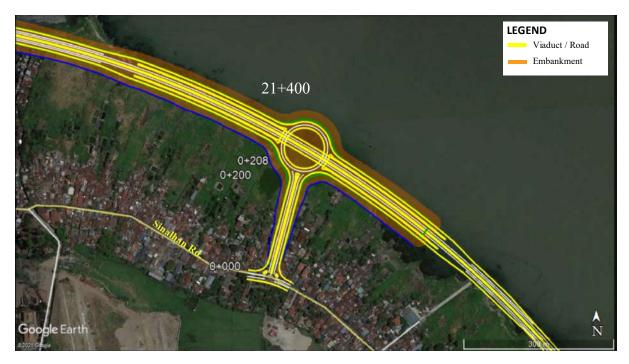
Proposed Grade-Separated Roundabout Interchange, Sta. Rosa Interchange
